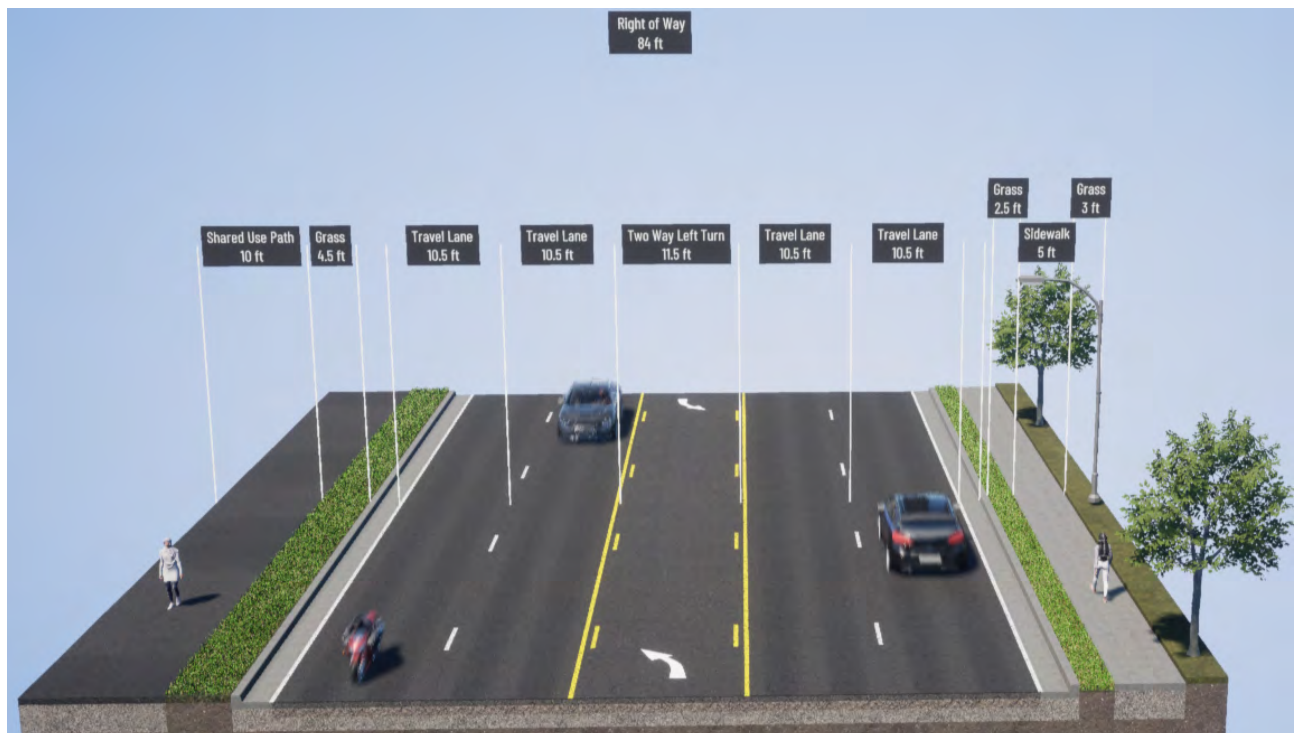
Typical Section for Port Republic Road (south of Peach Grove Avenue / Neff Avenue)
